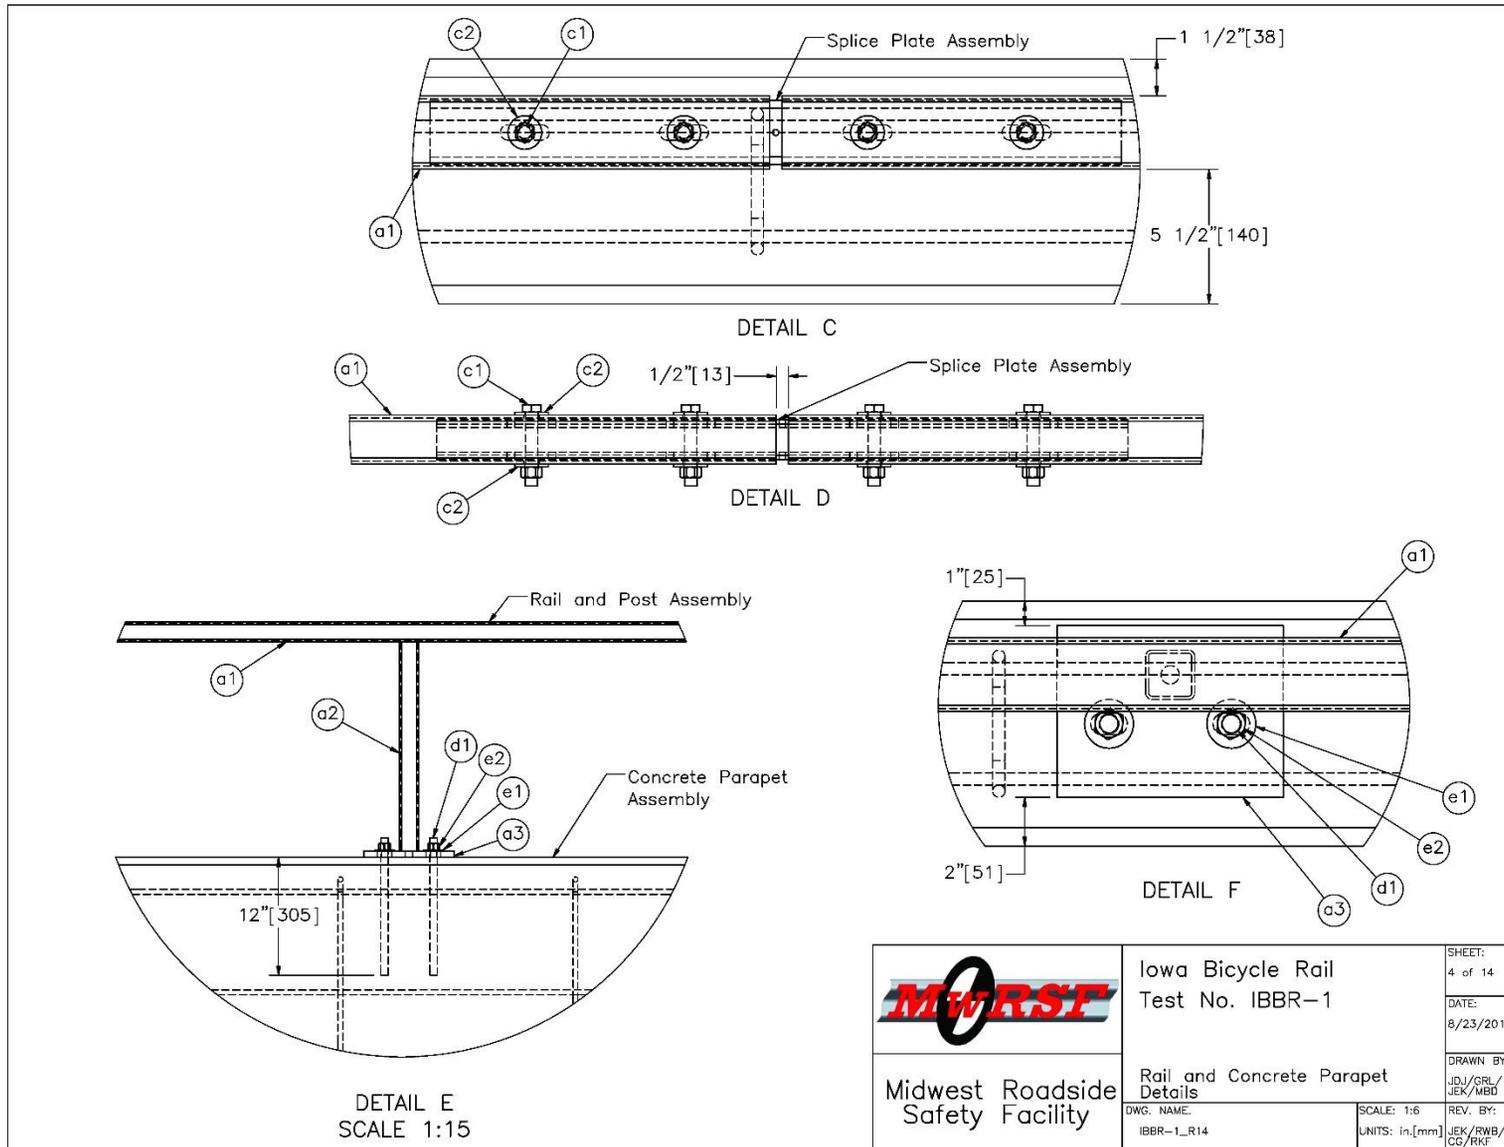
Rail and Concrete Parapet Details, Test No. IBBR-1
